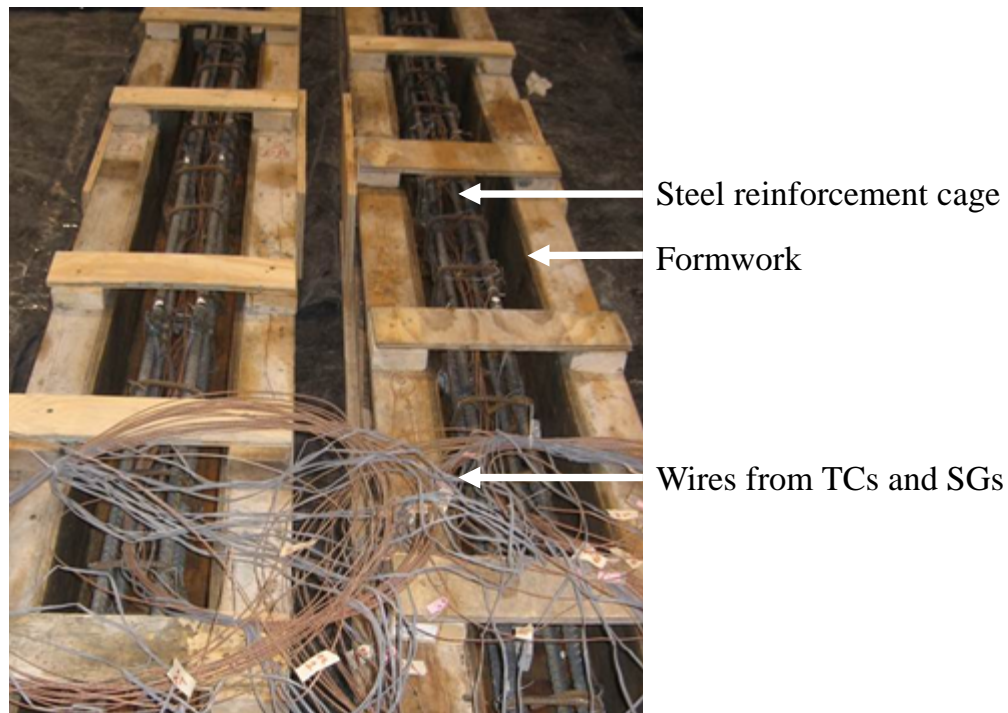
Steel cages inside column formwork with instruments wiring
